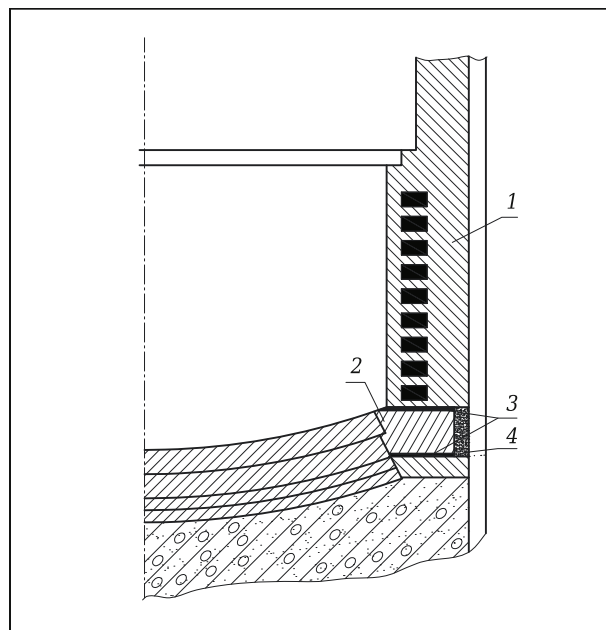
Design of sliding layer of ore-smelting kiln at OAO Pobuzh'ye Nickel Factory. 1 — cooled lining; 2 — uncooled assembly; 3 — layer of graphite; 4 — compensation zone.
